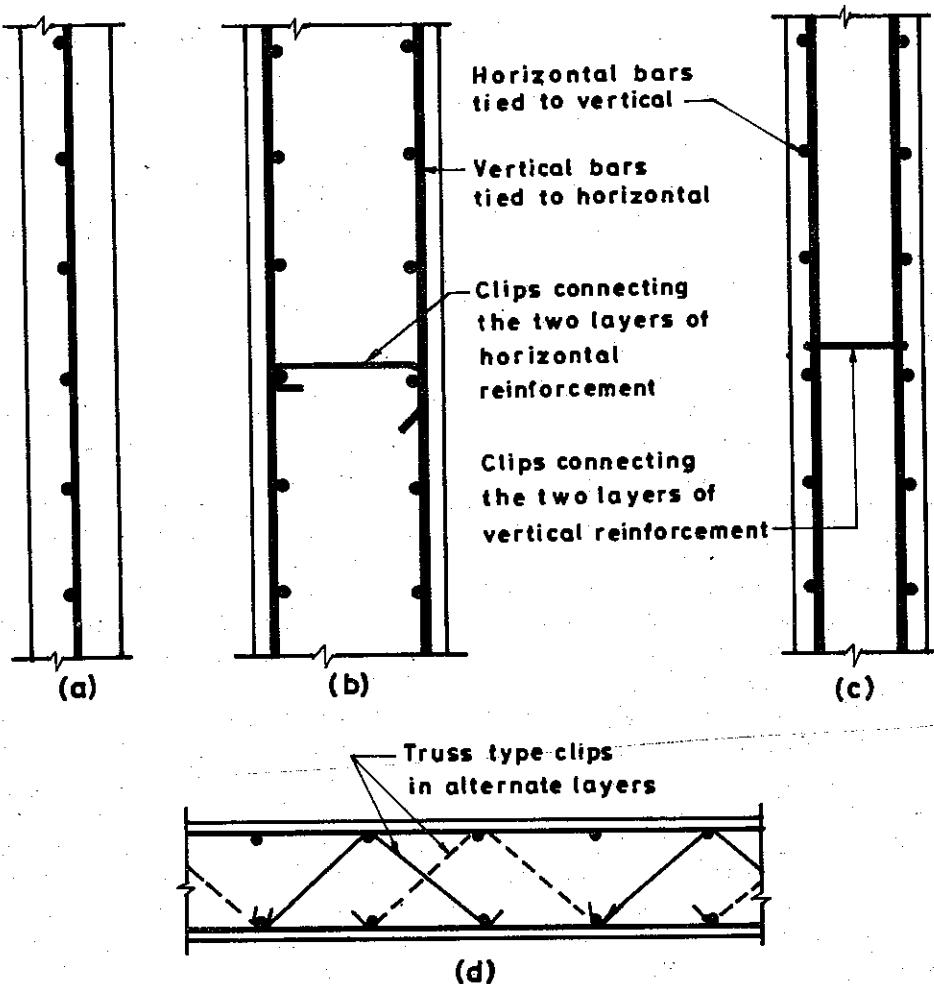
Detailing of steel in reinforced concrete walls: (a) Wall thickness ≤ 170 mm, (b) Wall thickness > 220 mm, (c) Wall thickness > 170 mm but < 220 mm, (d) Truss type clips (links) in alternate layers in a wall.
